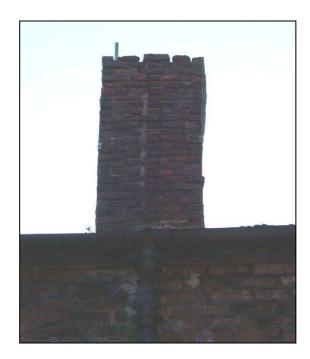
No. 3 South Henry Street (Scale = 2m)
